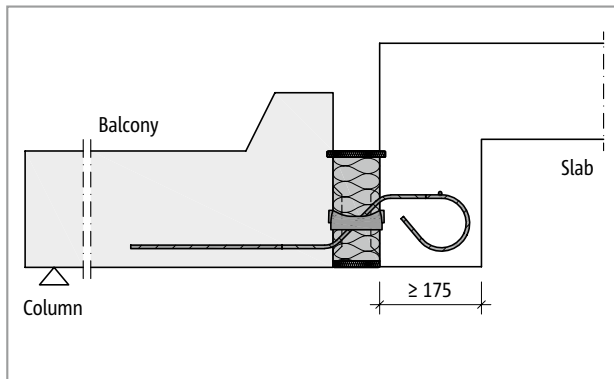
Schöck Isokorb® T type Q: Installation situation "pre-cast balcony slab" (e.g. T type Q-V1 to Q-V5)
